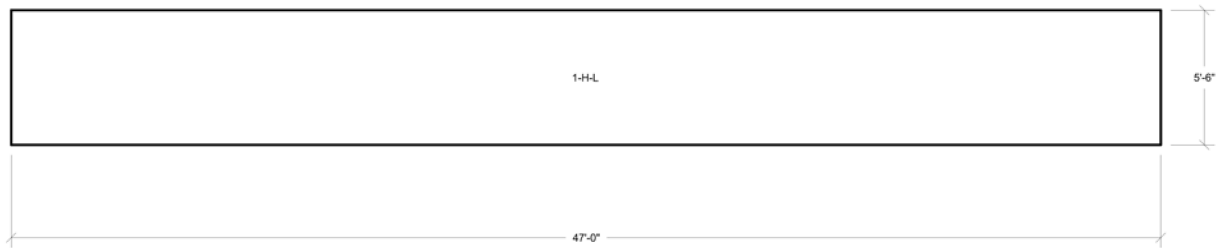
H.7-15 Tunnel and Access Region Basemat Looking Down Horizontal Reinforcement Zones Near Side and Far Side Faces
